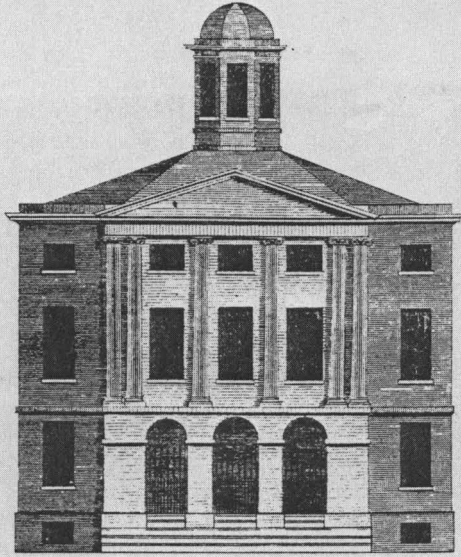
Asher Benjamin, "Plan and Elevation for a Courthouse," Plate 42 from *The American Builder's Companion*, Boston, 1806 (courtesy, New York Historical Society).
